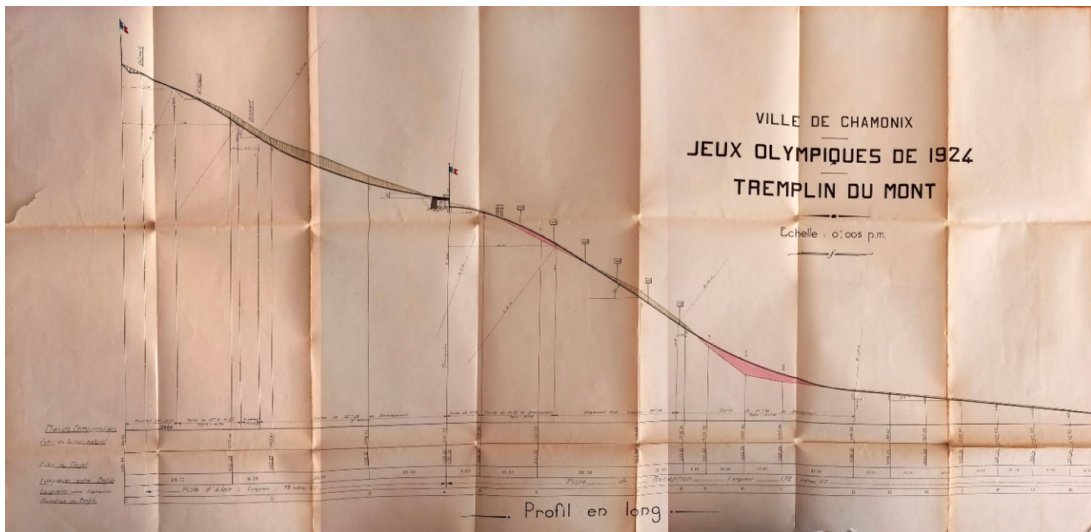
Project for the construction of a ski jump at Le Mont. Longitudinal profile 04/08/1923, 2 O 2182, Arch. dép. Haute-Savoie.
